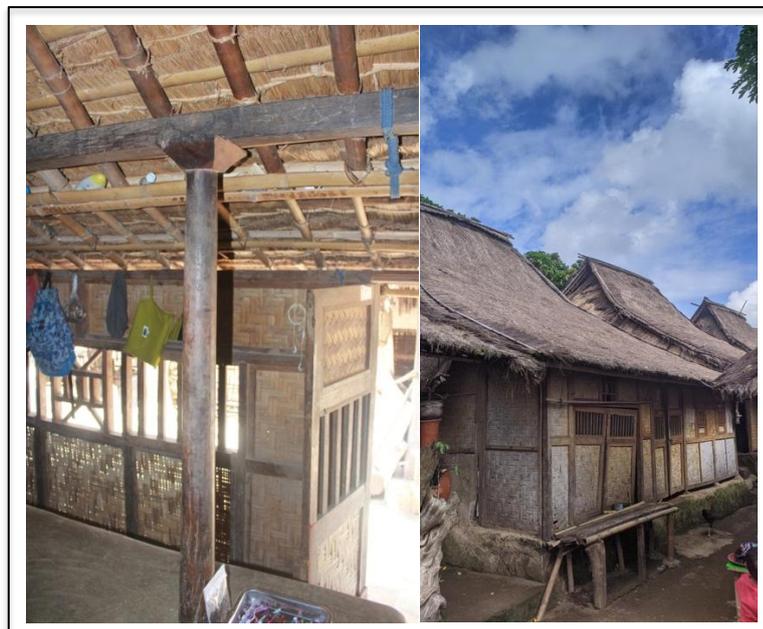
Configuration of The Building Mass Arrangement at the Sade Traditional House
